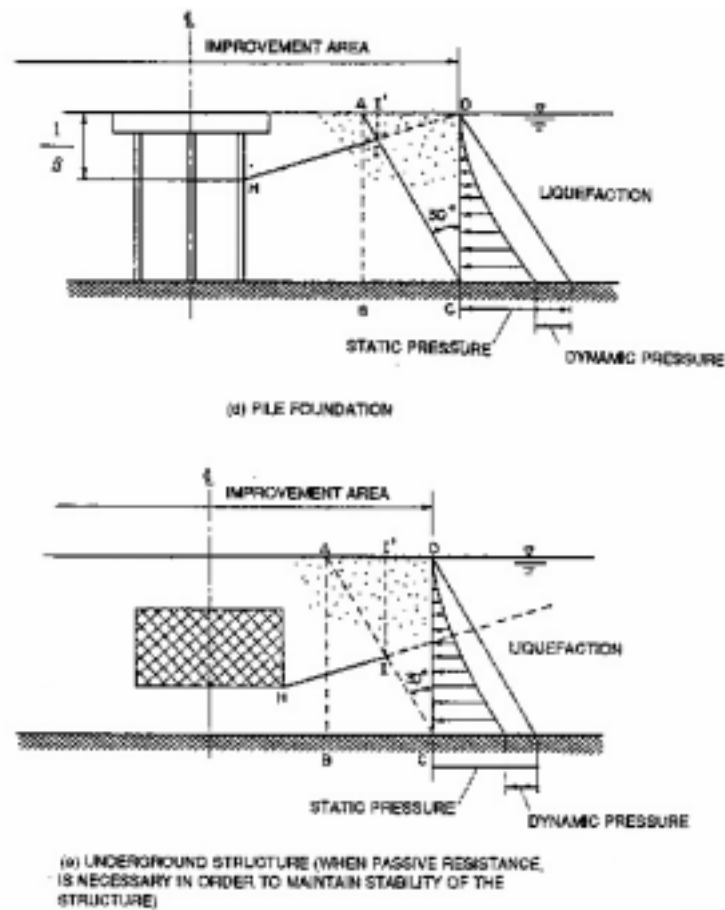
Improvement Area for Pile Foundation and Underground Structure (PHRI 1997; JGS 1998)
